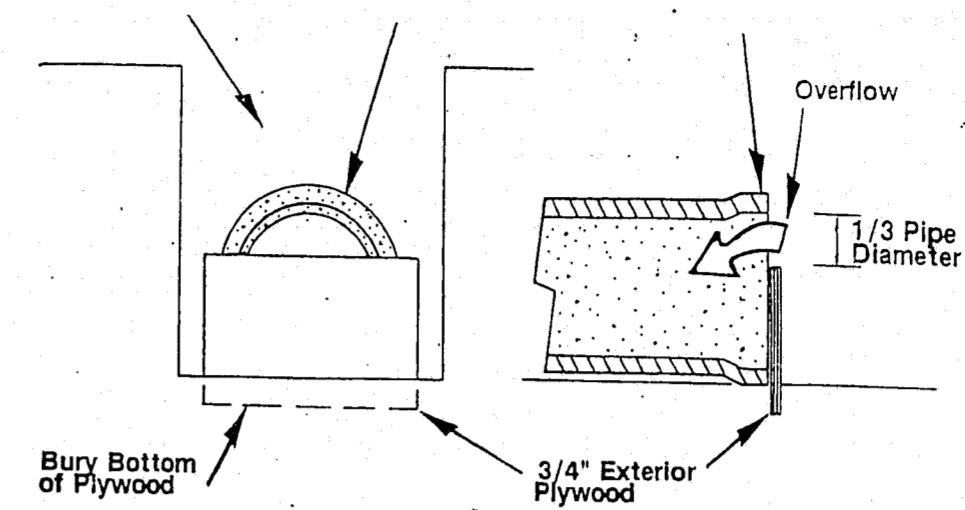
Illustration of Plywood Inlet Protection for Storm Drain Under Construction.
